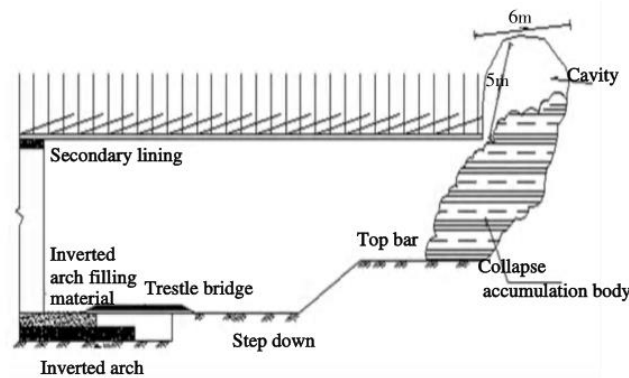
Barrow tunnel no. 2 slip and fall cross section.
